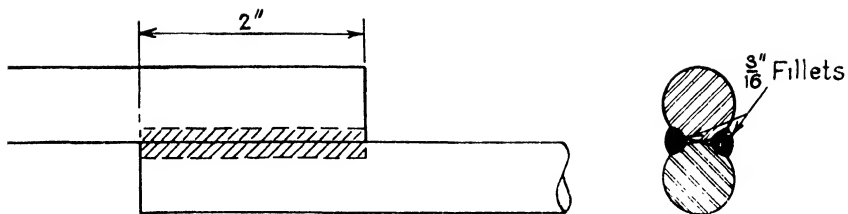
LAP WELDING OF SMALL SIZE REINFORCING BARS
